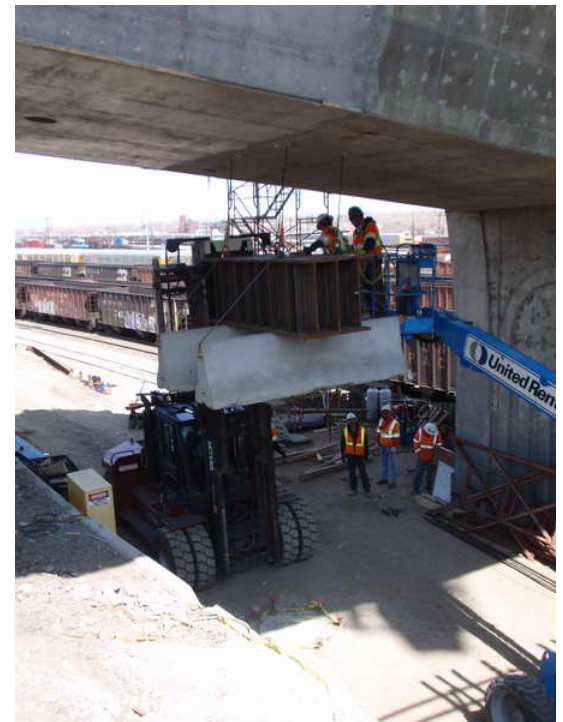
Cantilever 3 WB Segmental Construction –April 13, 2009:
